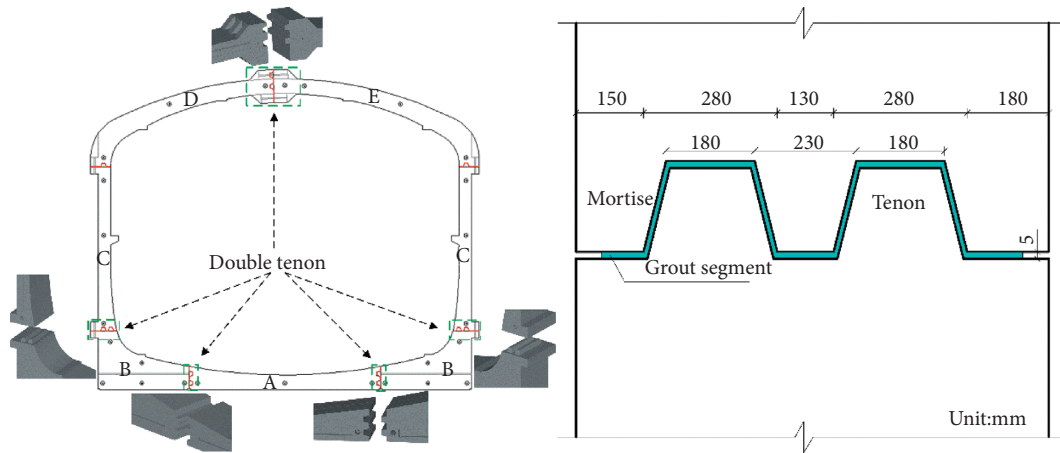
Arrangement and detail of double mortise-tenon joint.
